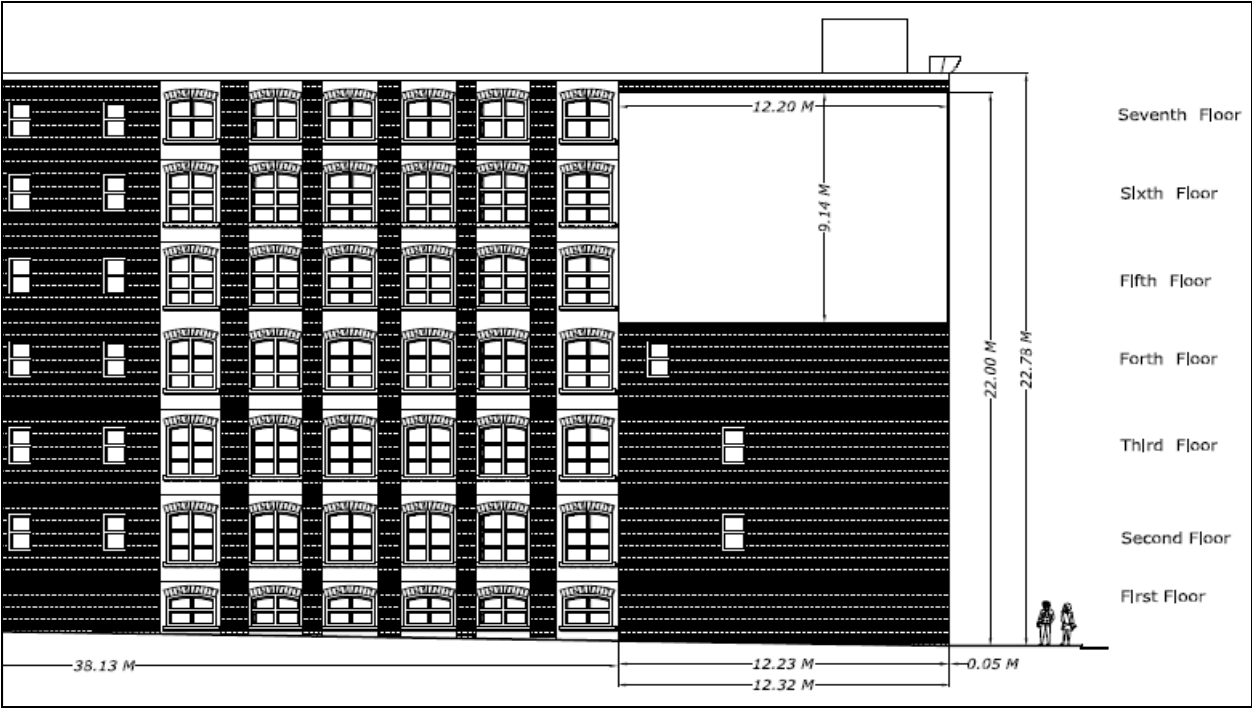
Photo Rendering of Proposed Sign at 174 Spadina Avenue (South)
